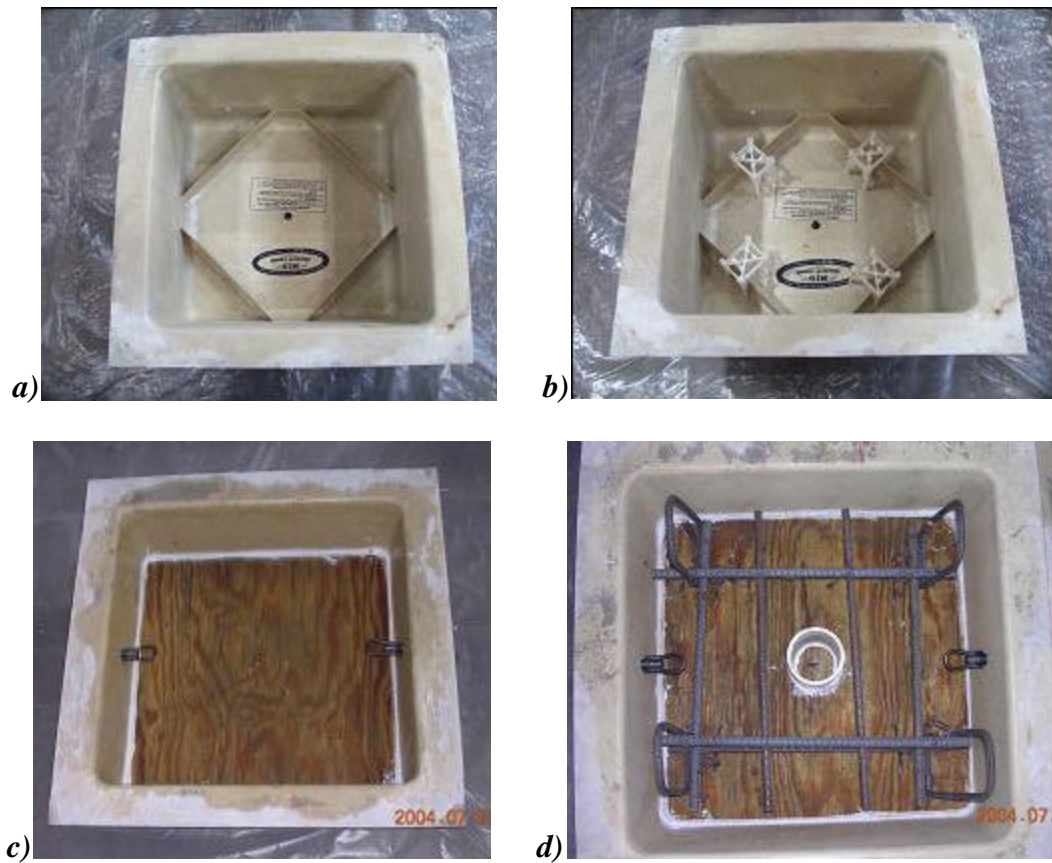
Waffle forms: a) Inside of waffle form b) with plastic chairs c) with plywood sheet and inserts d) with reinforcing cage and PVC pipe
